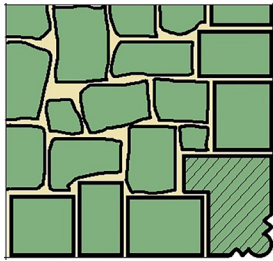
Application of a stone block “with a hook” in the construction of the cornerstone of the wall of the Kholm castle
